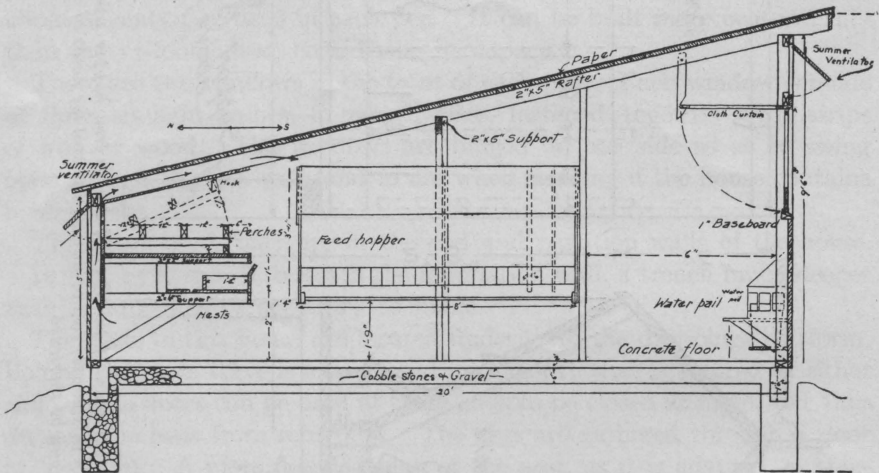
A cross-section plan of a Cornell poultry house with pens 20 feet square. Note that all fixtures are above the floor. Two 12-foot rafters instead of one 21-foot rafter can be used, in which case the ends of the 12-foot rafters would side-lap each other over the center support
